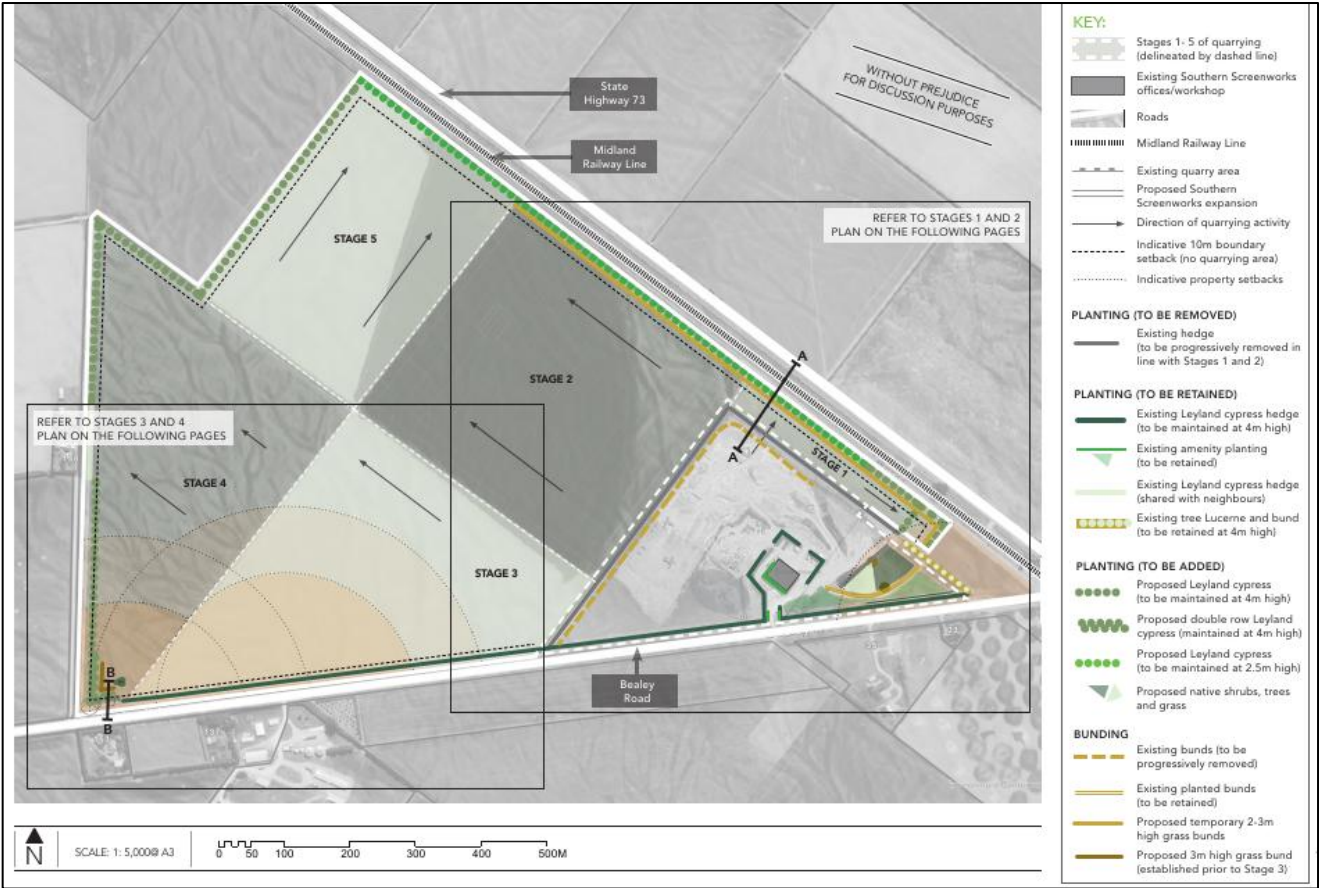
Proposed Landscape Mitigation Plan (Source: Applicant)
